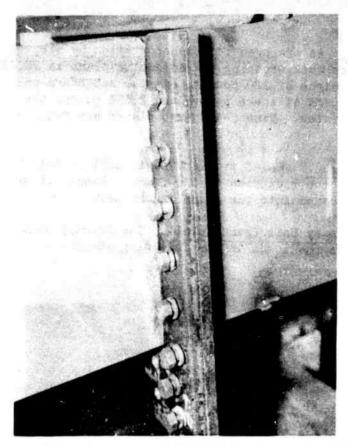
BUTT-PLATES INSTALLED (PRIMARY UNIT)
